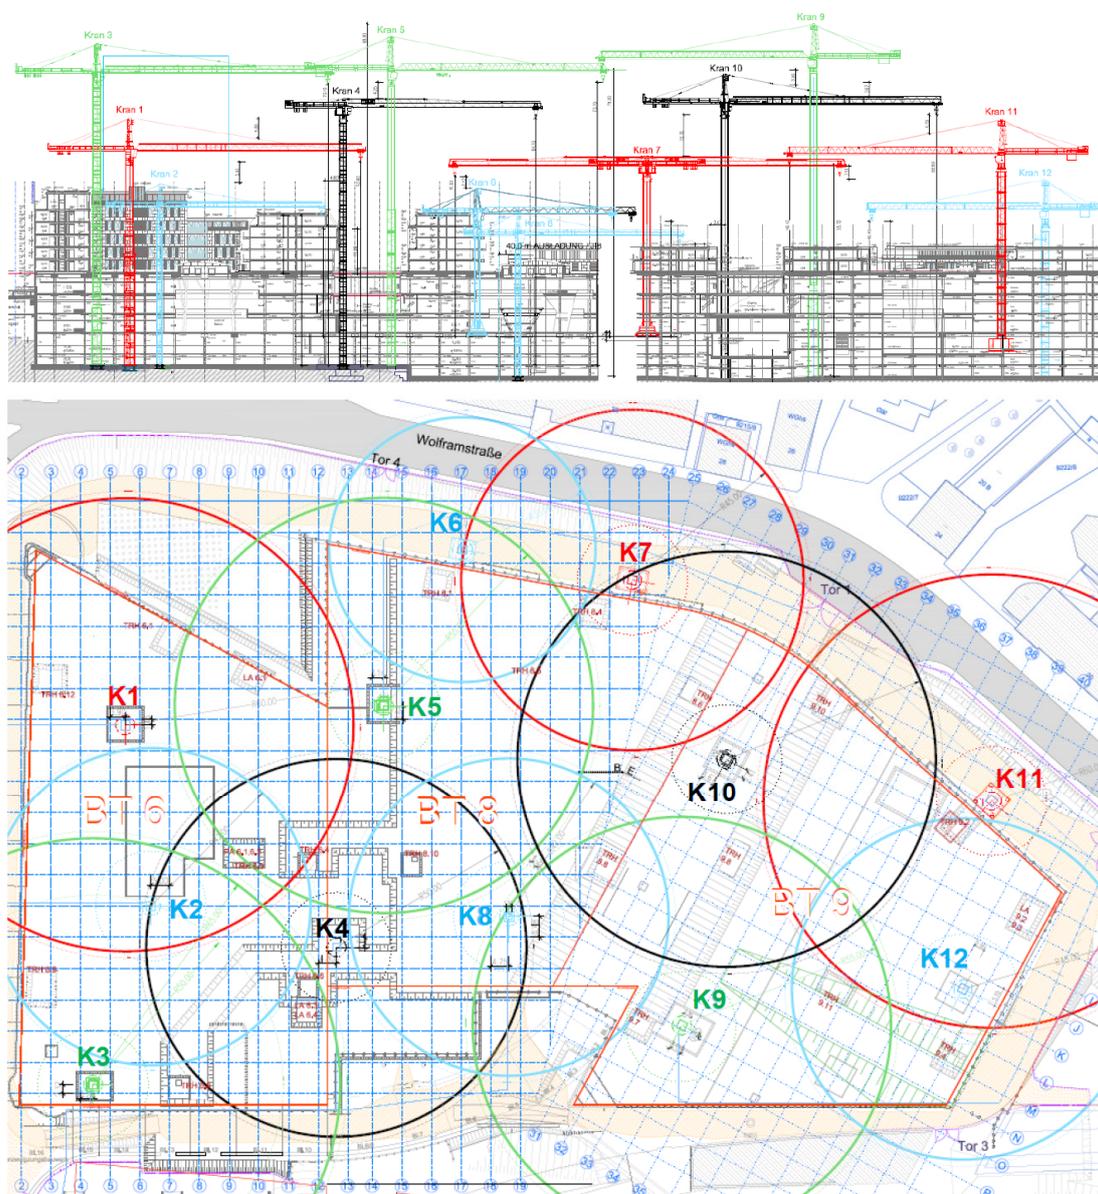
Multi-crane site (12 tower cranes): top–elevation; bottom–plan.
